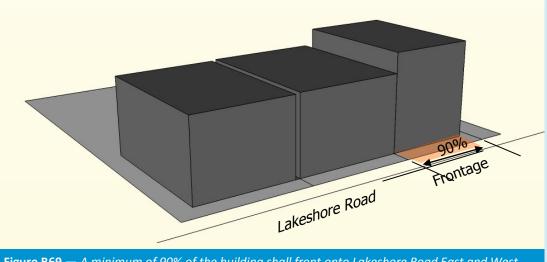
A minimum of 90% of the building shall front onto Lakeshore Road East and West and be within 0.0 m to 3.0 m
